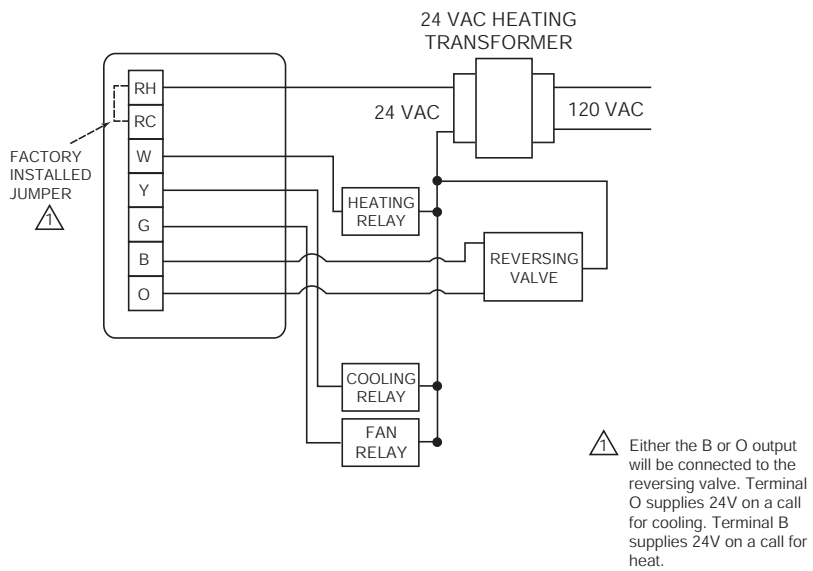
Typical T207 Wiring To Heating/Cooling System With Single Transformer & Reversing Valve.
